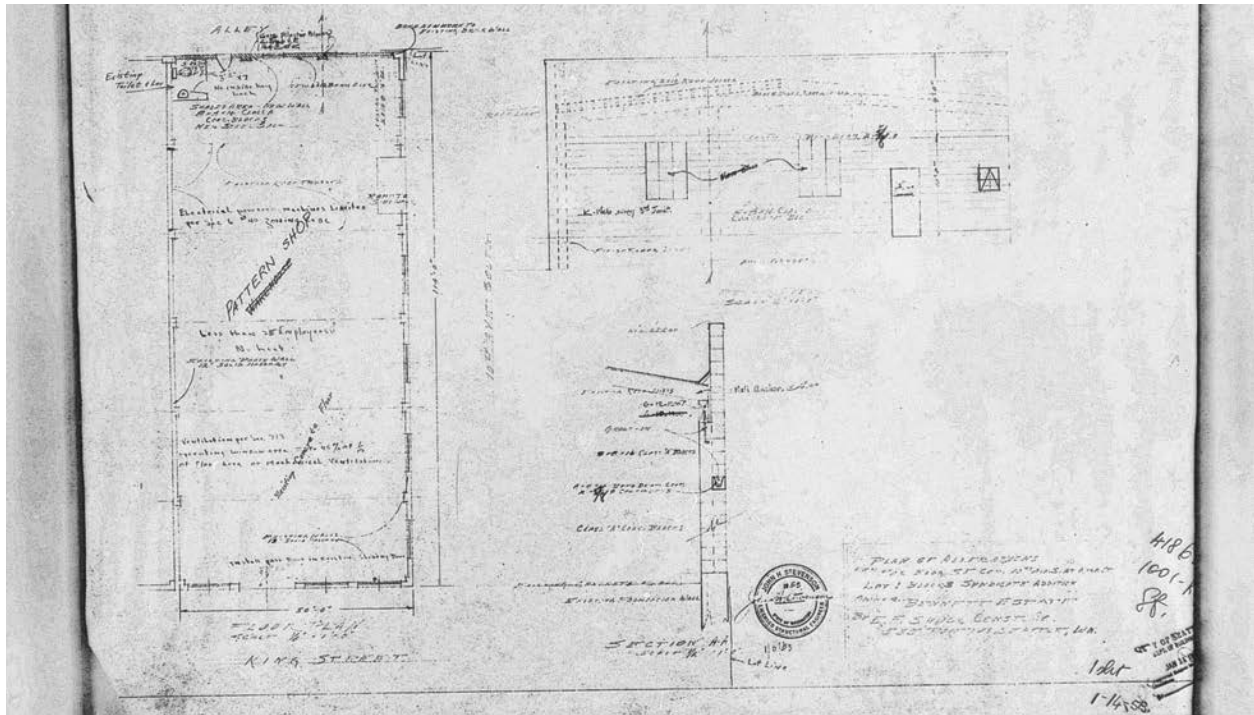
1001 S. King Street - Pattern Shop Plans (01/14/53)
